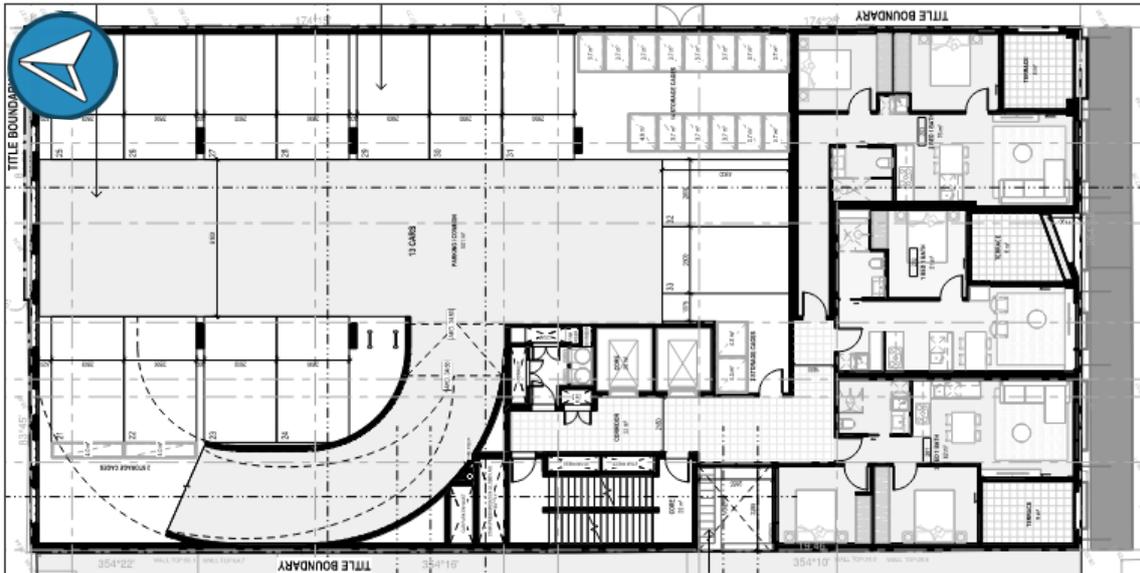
Proposed Level 02 Plan (Image Source: Cera Stribley)
